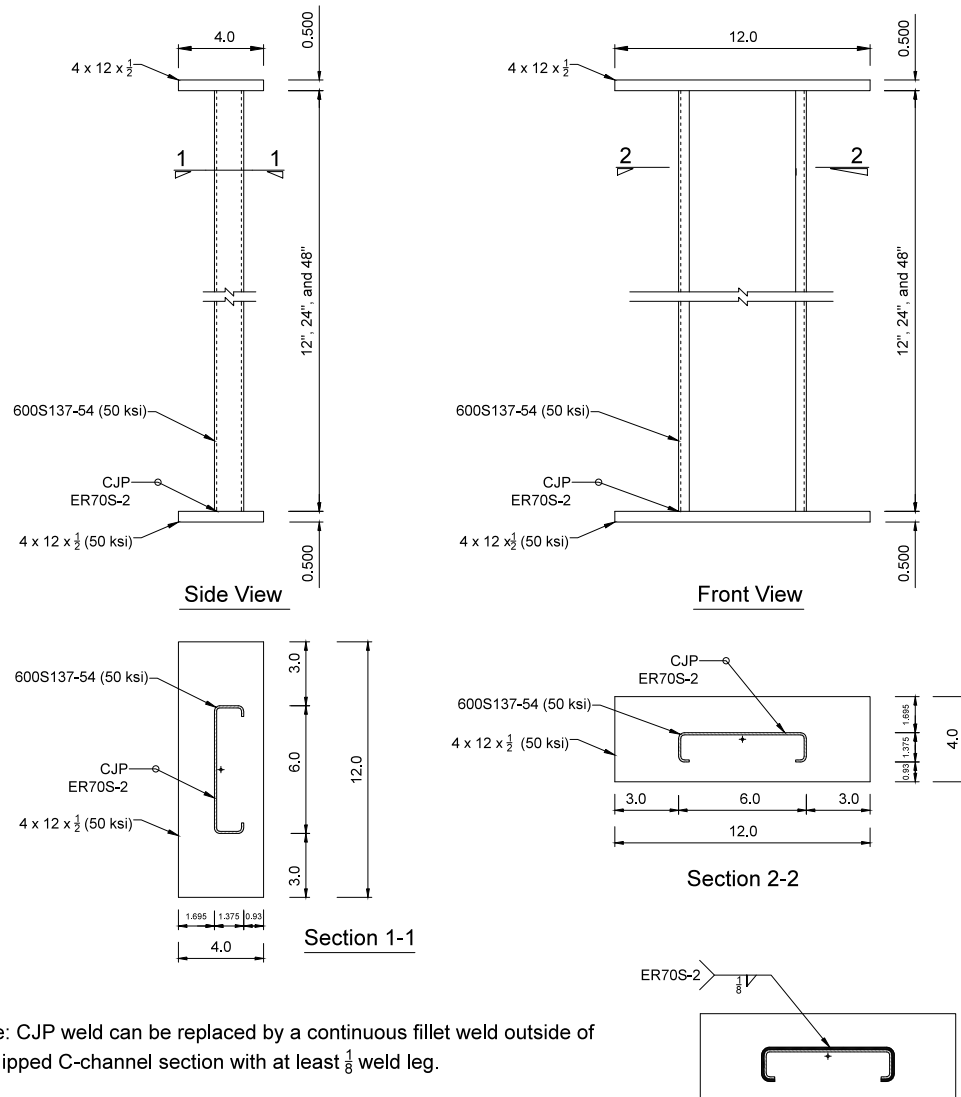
Test specimens: 600S137-54 (L=12, 24, and 48 inches)
